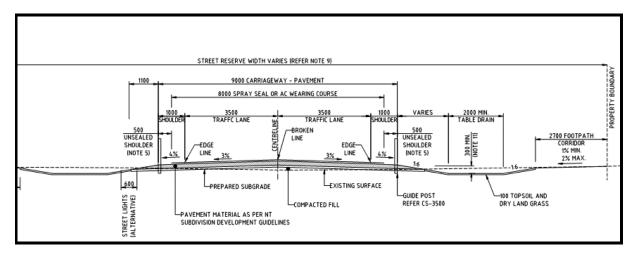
NT Subdivision Guidelines Standard Drawing SS1005 Road Cross Section – Rural
